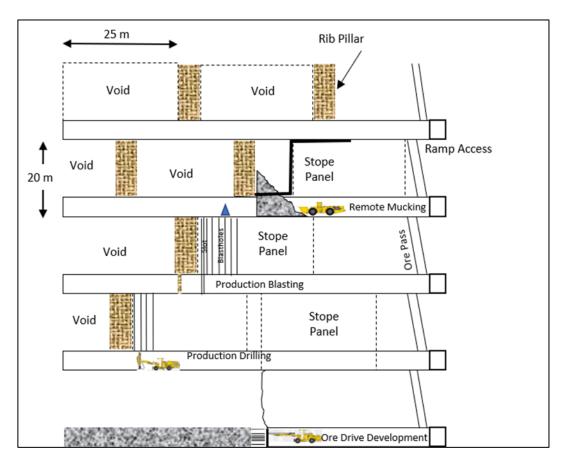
Example Long Section of Longitudinal LHOS Extraction
